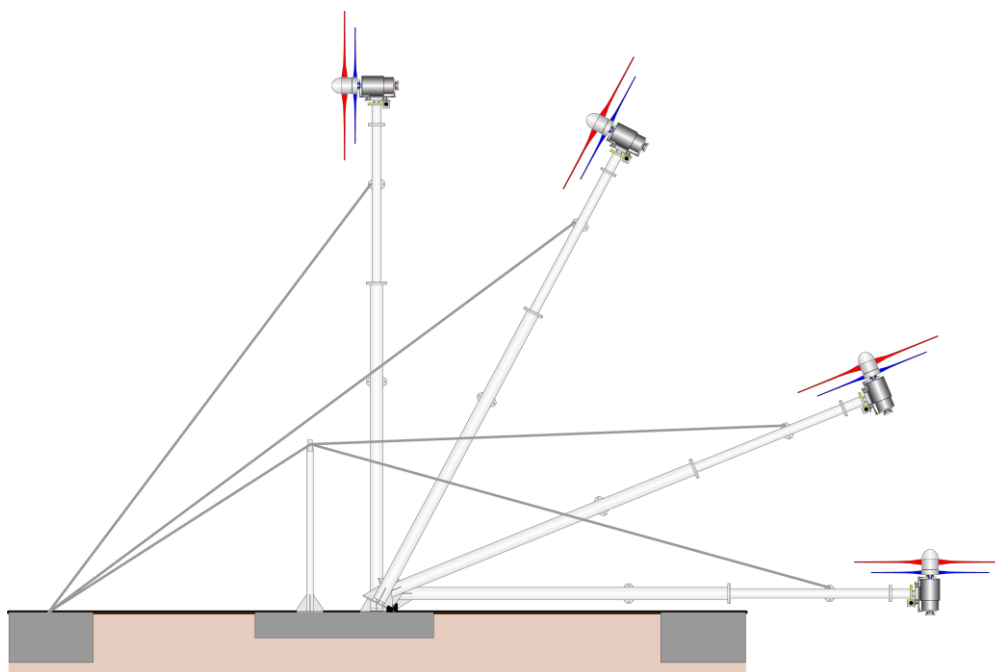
Erecting and lowering the tower and wind power unit using guy wires
